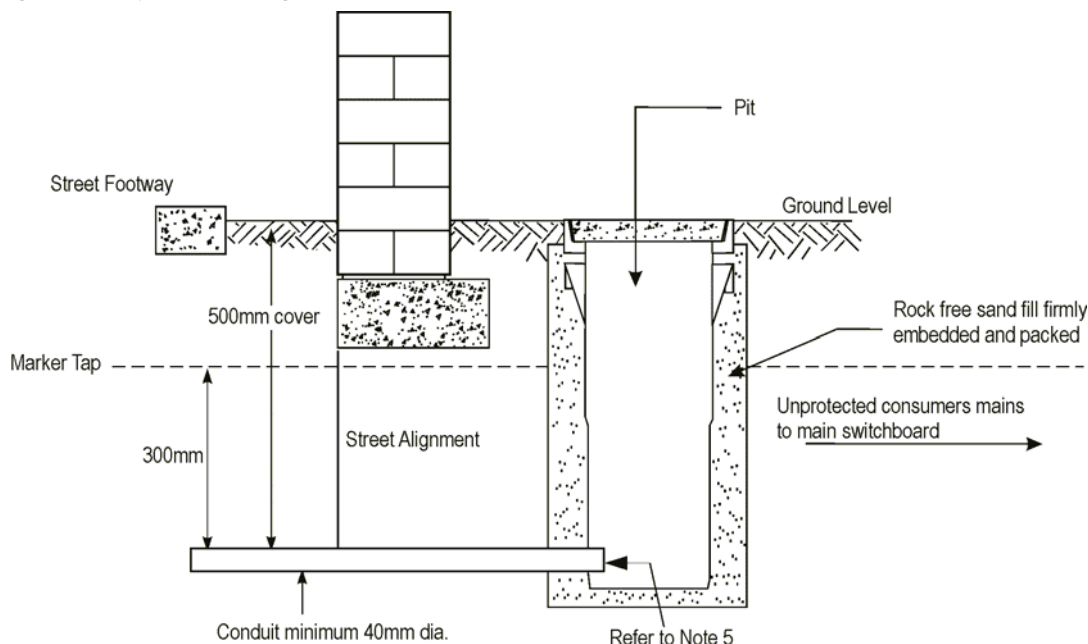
Typical underground service installation to a consumers termination enclosure - (pillar)
